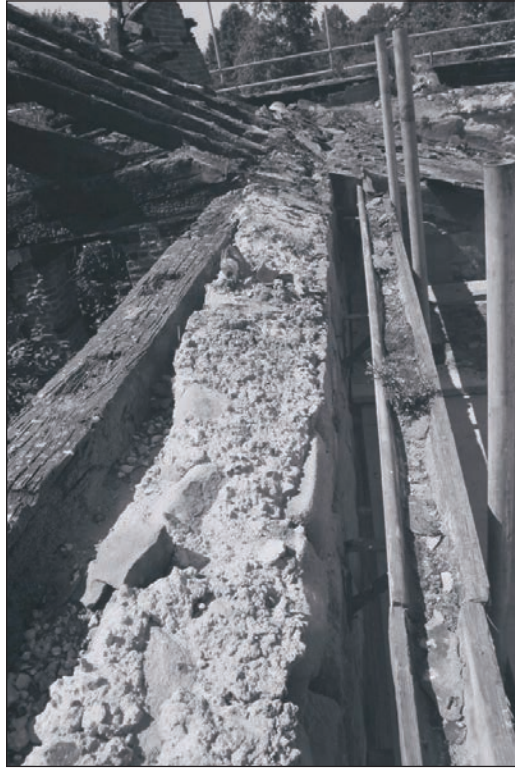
View along wall head of north wall of Building 3 (Film 26.20)
